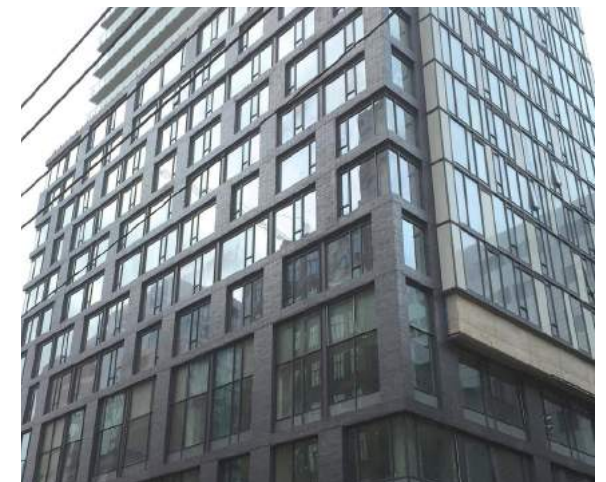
Window wall system, Peter Street Condos, Toronto (Image Credit: Urban Toronto)
